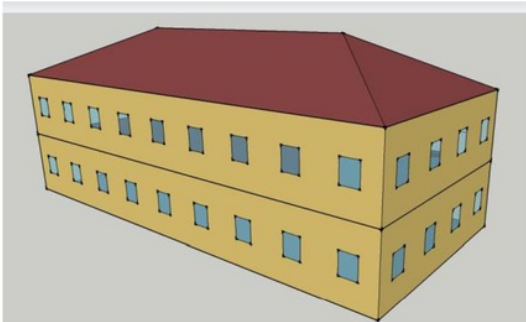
Colonial office building model without sun shading (0 m) and wall openings of 10%.
